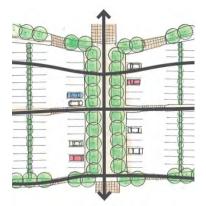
Strong pedestrian connections improve safety and accessibility and large planted areas break up the visual impact of the surface parking and provide opportunities for on-site infiltration.
